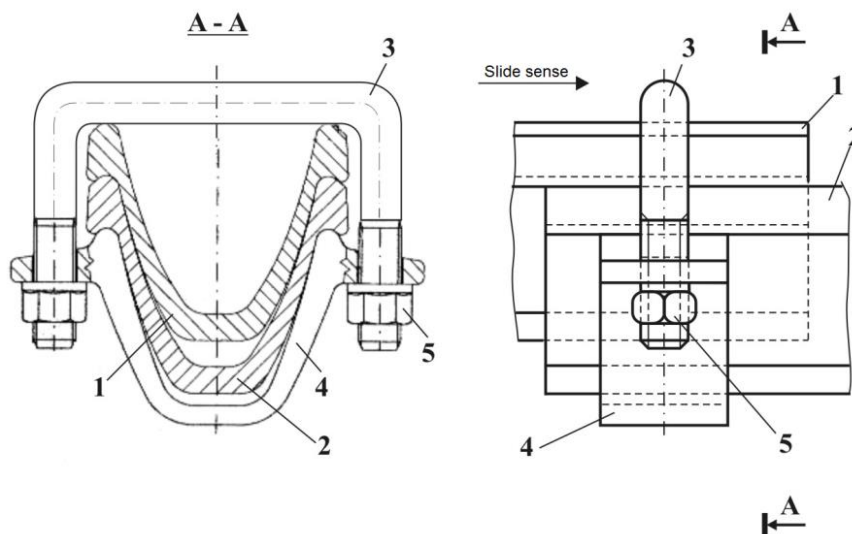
Metal construction supporting the new improved form: 1,2-laminated profiles, superior (beams) and lower (pillar); 3- round necklance of tightening and joining the clamp; 4- lower flat clamp; 5- the nut threaded necklance of clamp
